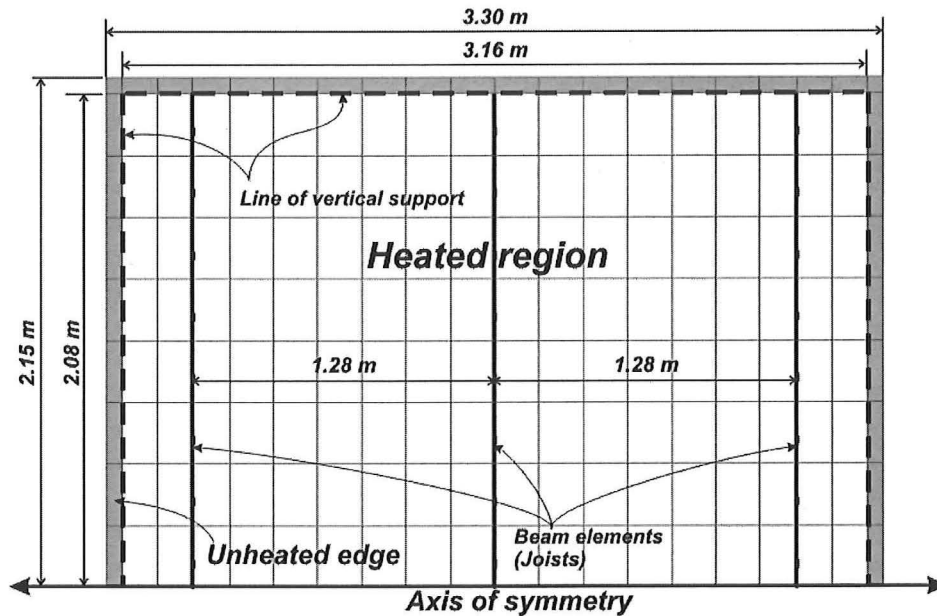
Finite element discretisation of the Speedfloor slab with beam and shell elements.
